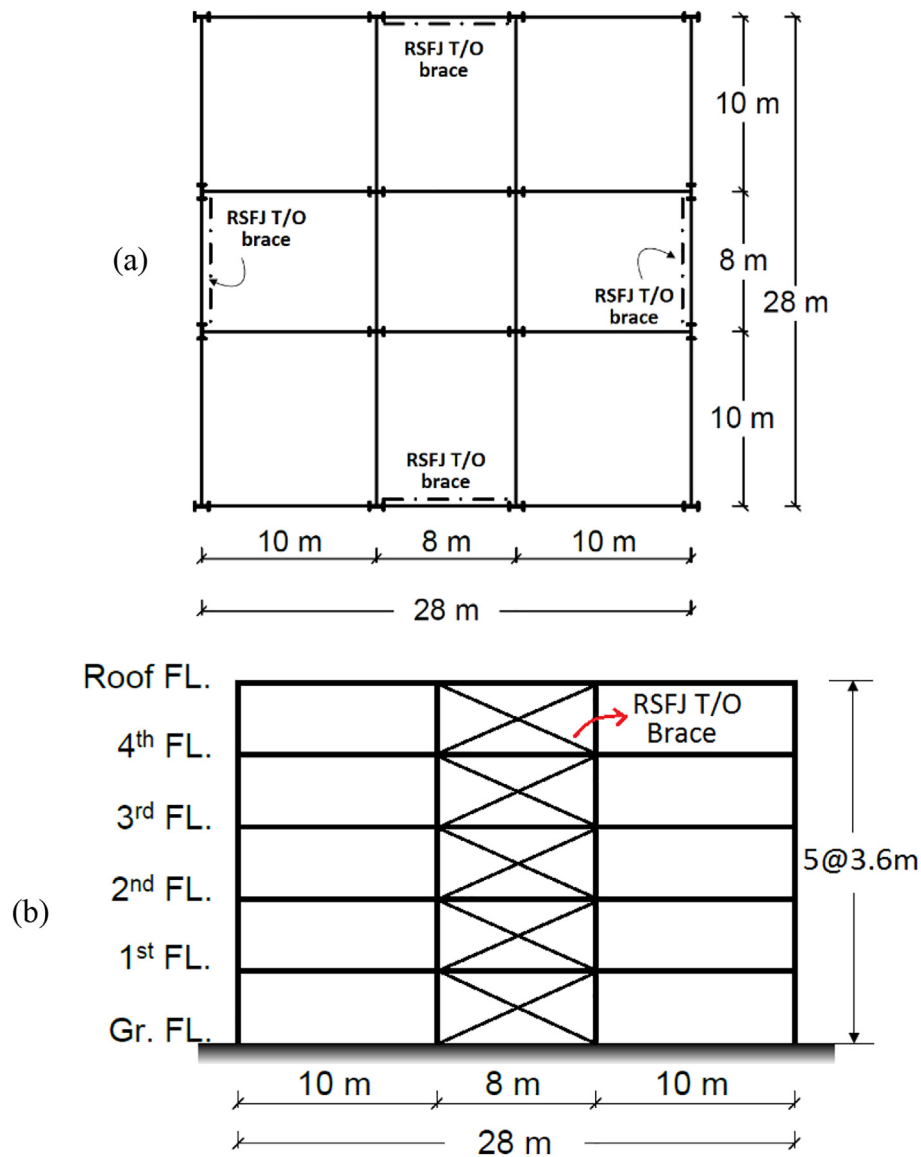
General configuration of the case study structure: (a) plan view (b) elevation view.
